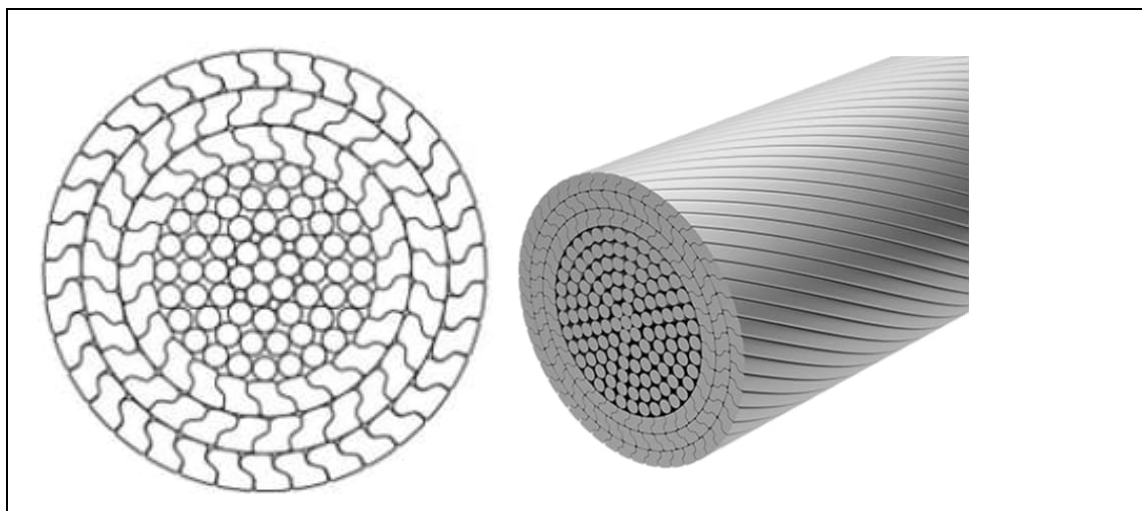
Cross section of fully locked coil cable (Teufelberger Radaelli, 2022a)
